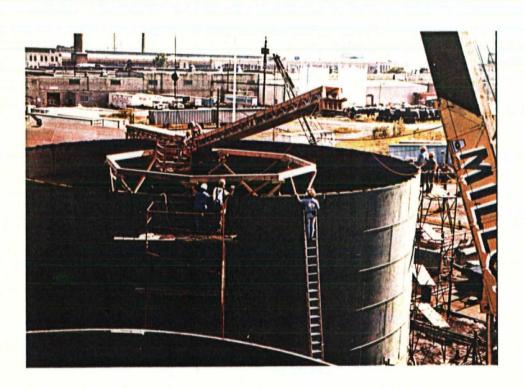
Installing Center Joist, Tank A-7. 8/23/85
